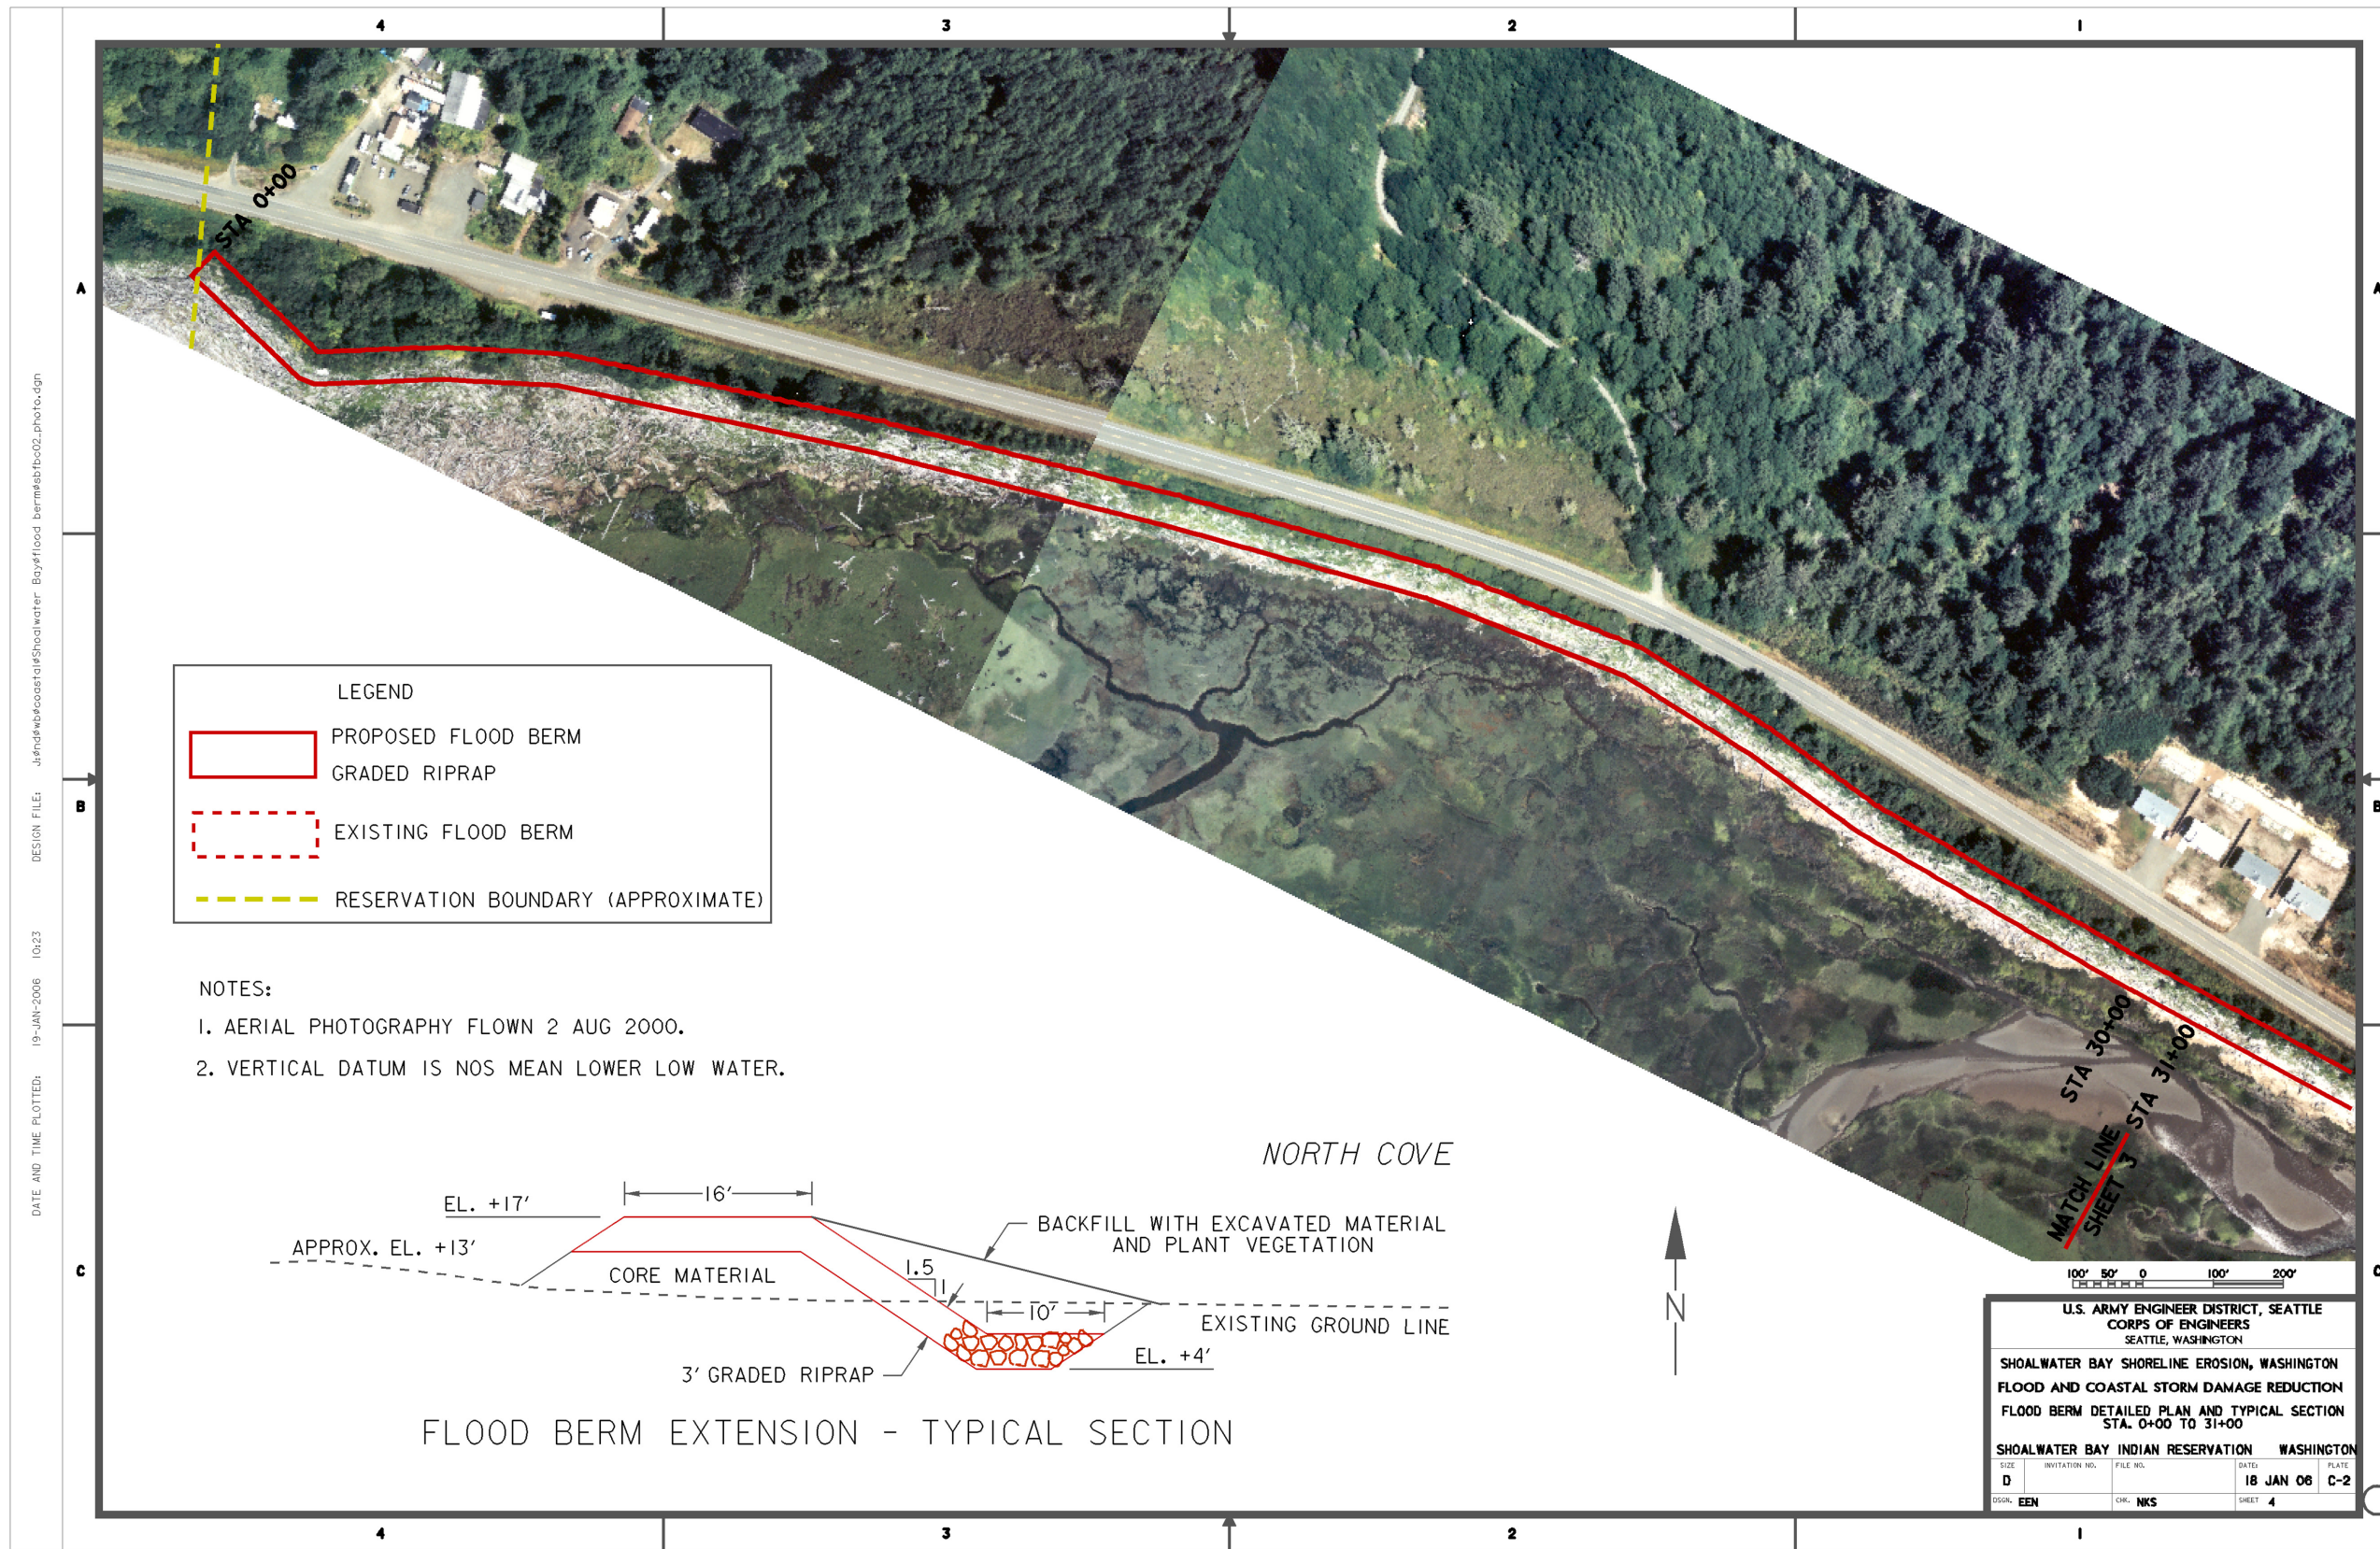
Flood berm detailed plan and typical section, station 0+00 to 31+00.
